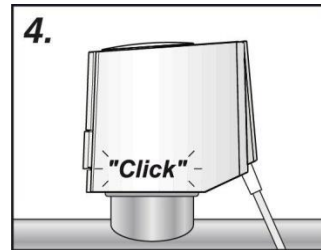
Step 4: Pressing down actuator onto valve adapter
